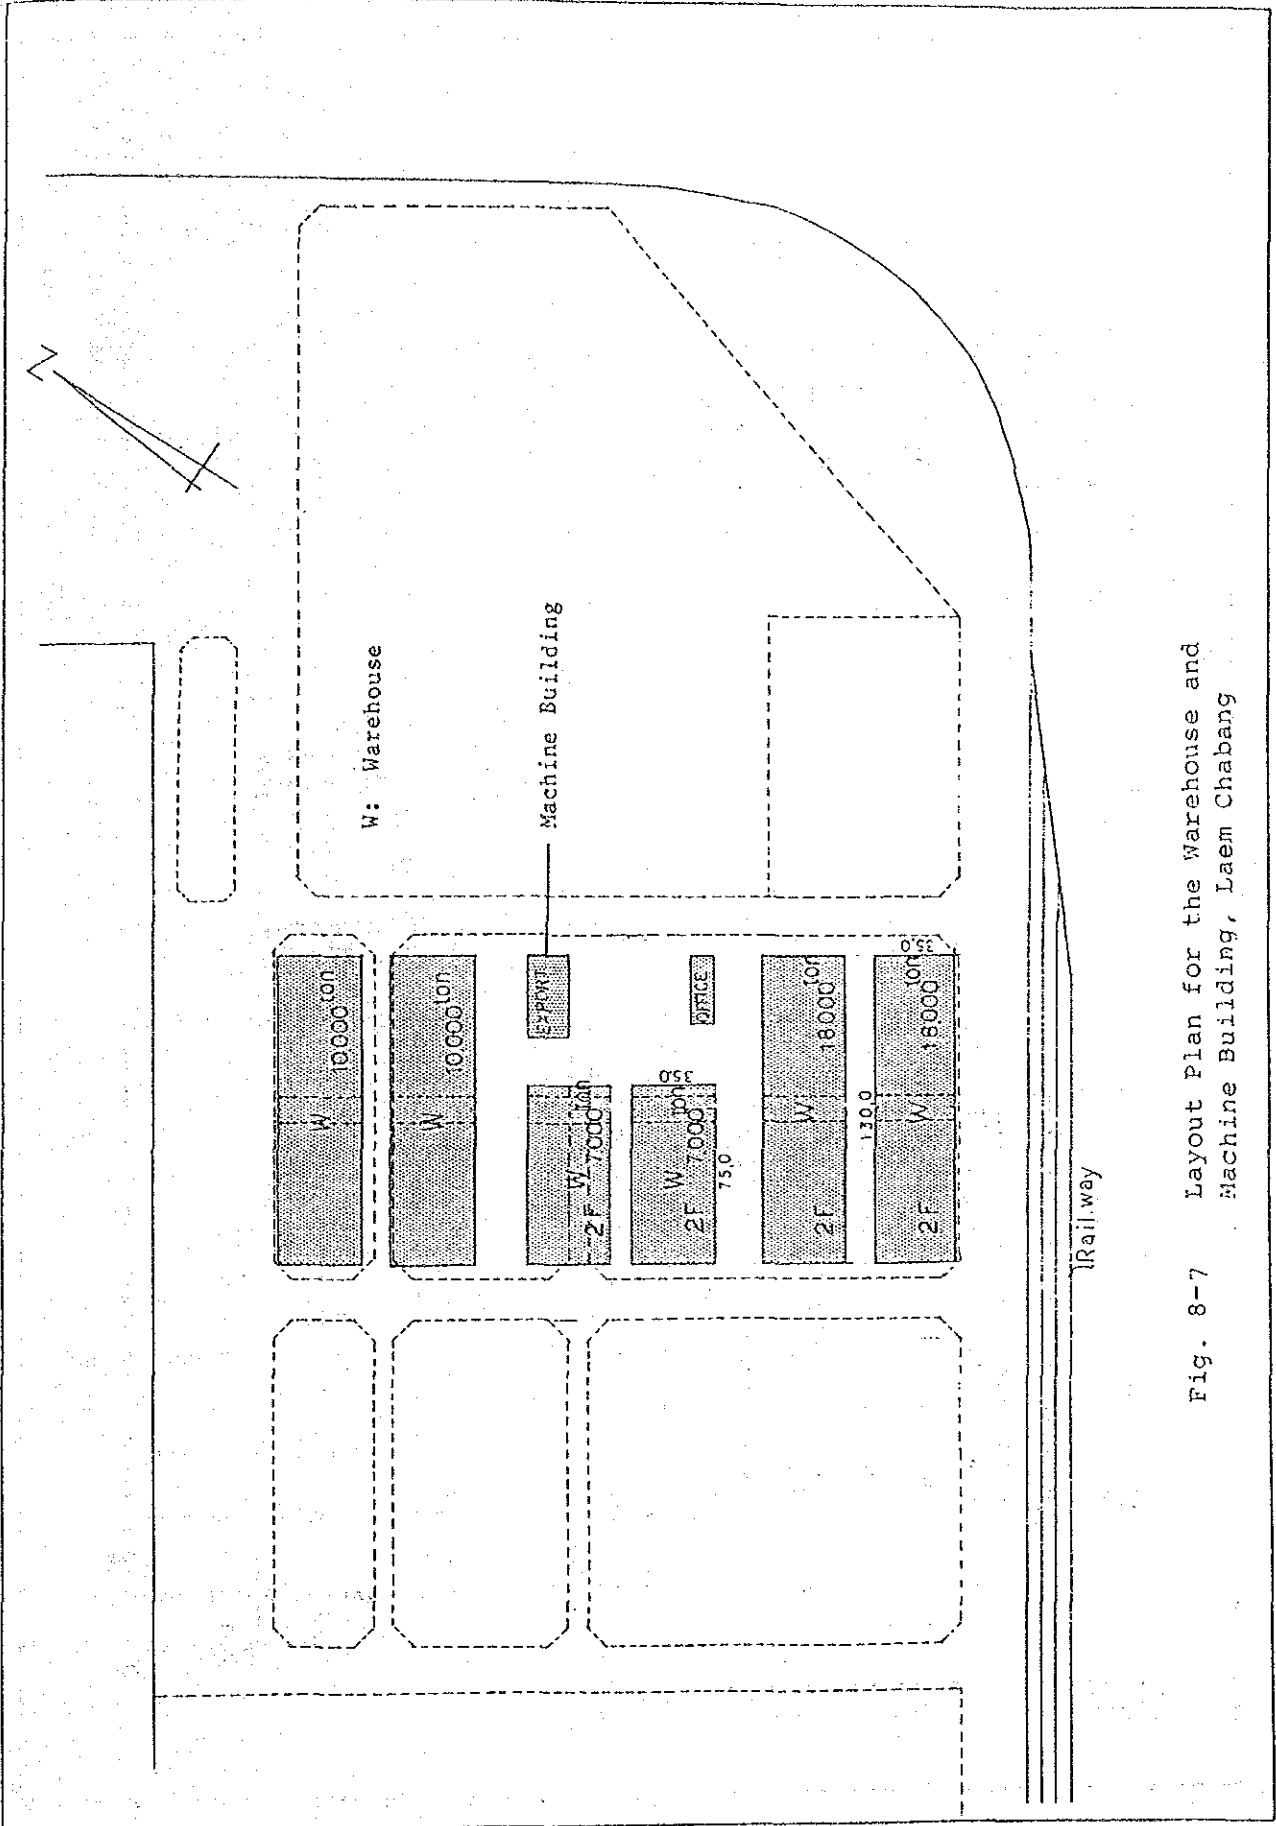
Layout Plan for the Warehouse and Machine Building, Laem Chabang
